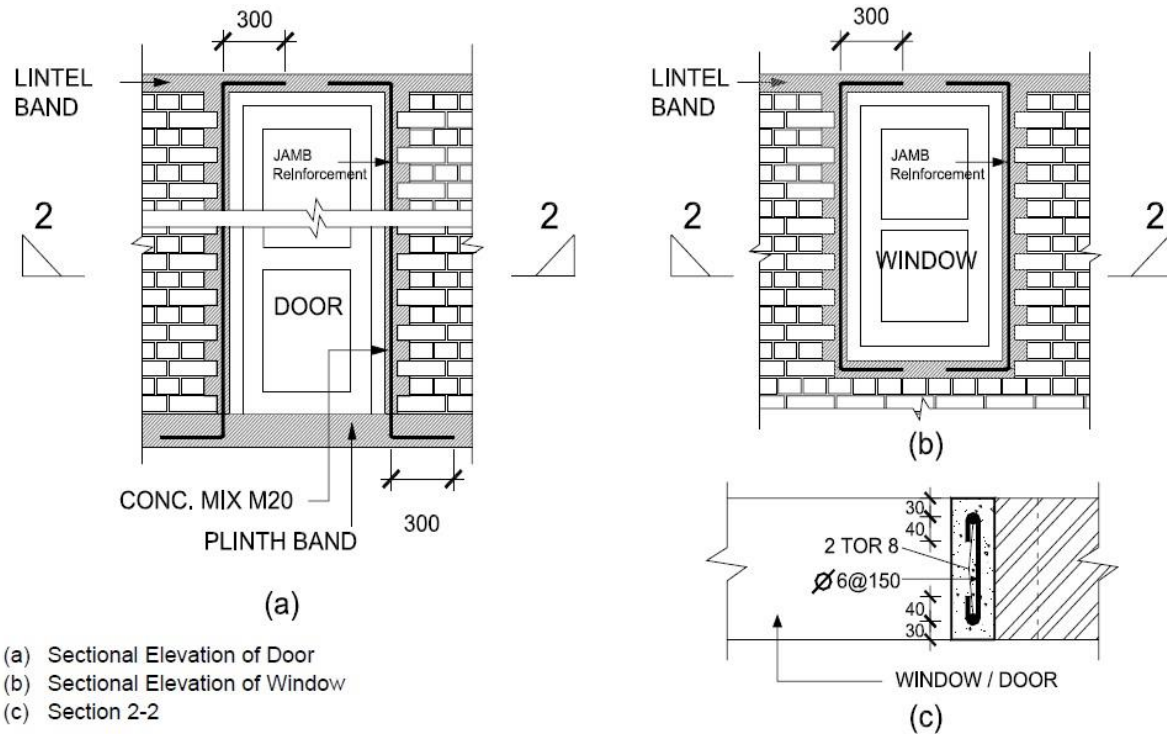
Details of Providing Vertical Steel Bars at door and windows opening (Source: Earthquake Safe Construction for seismic zone IV, NDMA)
